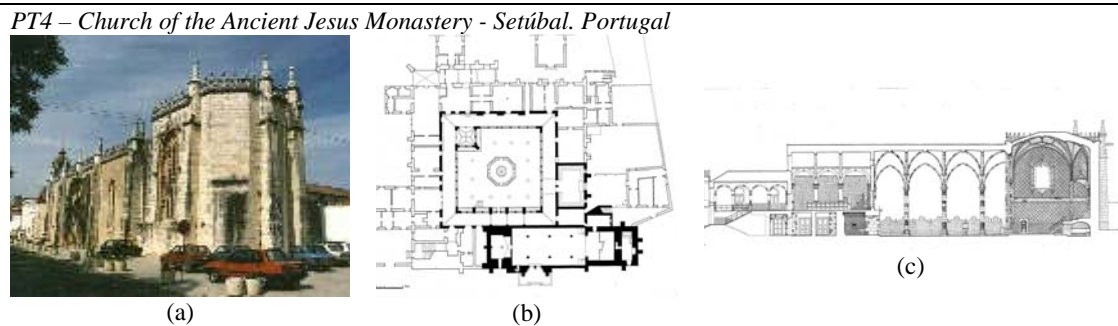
Geometry: (a) photo; (b) plan; (c) longitudinal cross-section
